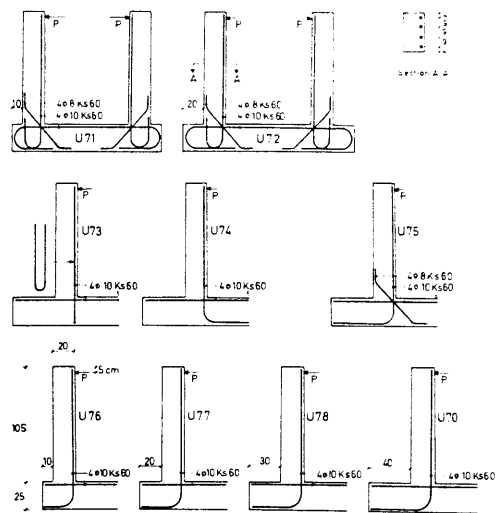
Test Program for Retaining Wall Joints (1 in. = 25.4 mm)
